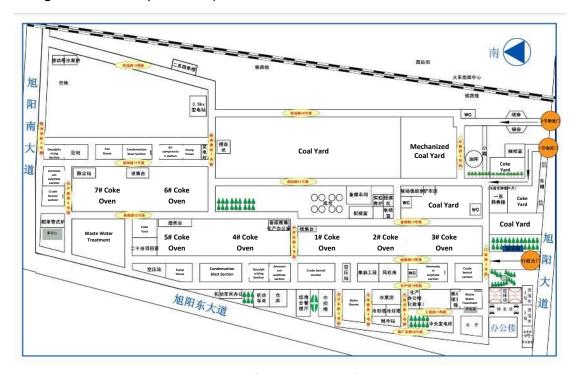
Layout plan of the plant area of China Coal RISUN
